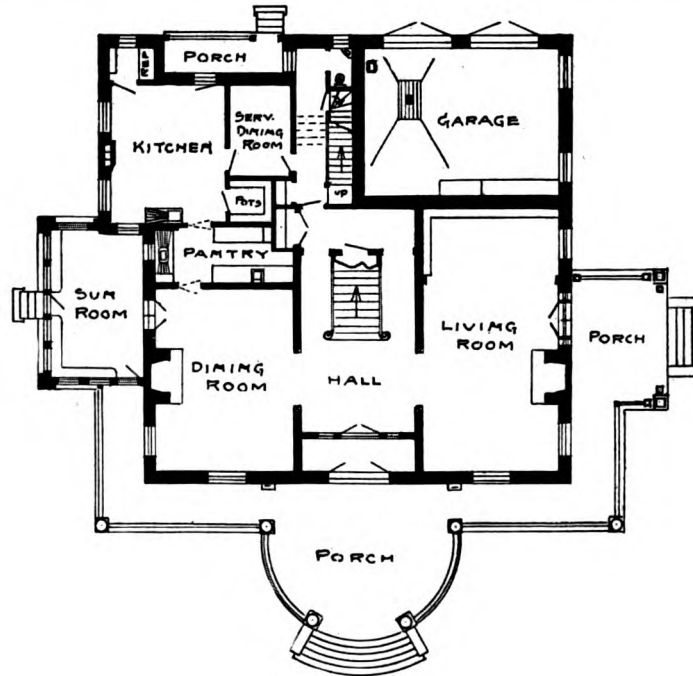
VIEW AND FIRST FLOOR PLAN.
